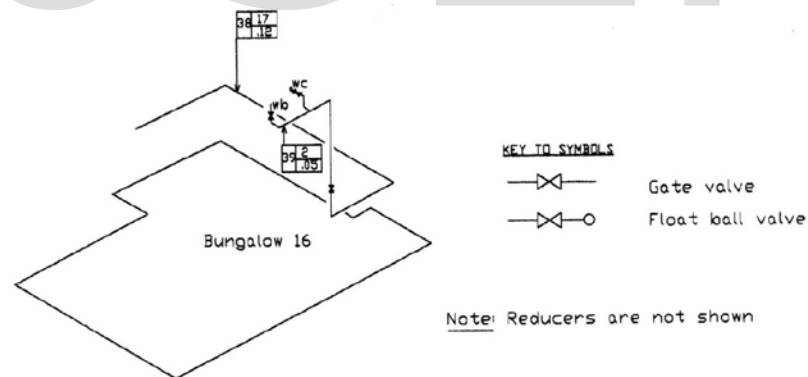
Isometric Sketch Showing Last Pipe Section (Section 39)
